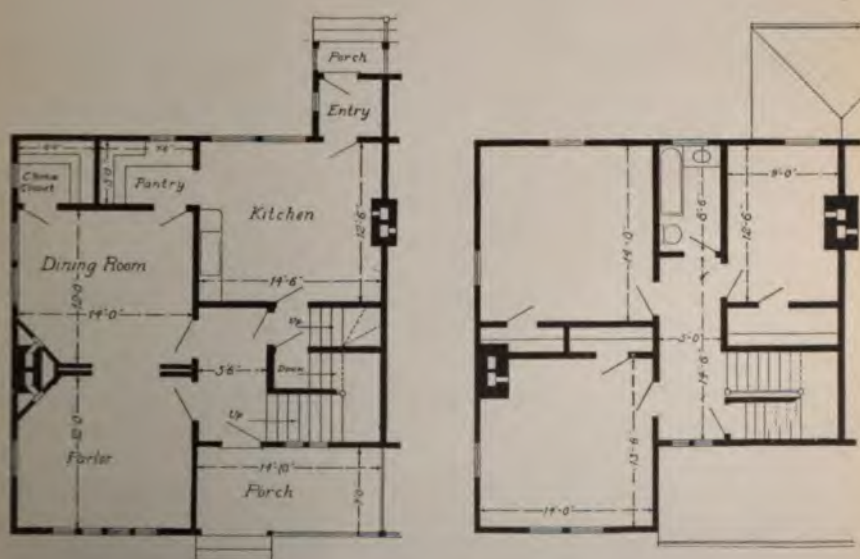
HOUSE FOR EMPLOYEES, PLAN B
